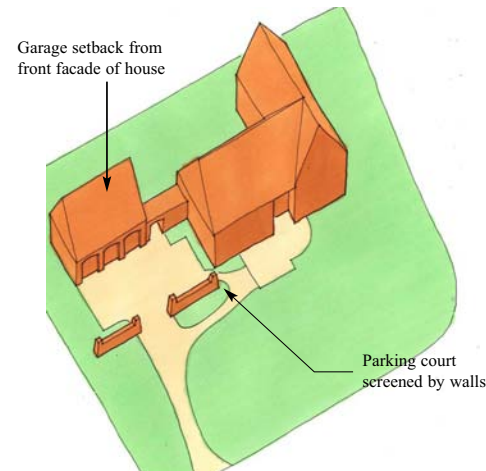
Image E: Front loaded garage at Woodland Preserve, Mountain Estate, or Hamlet Lot
